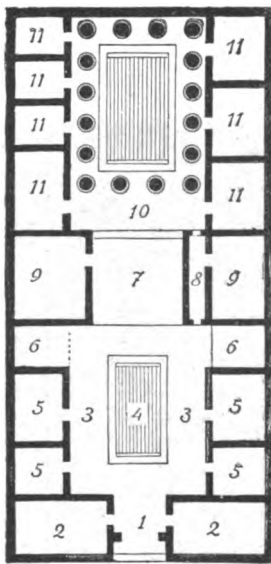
GROUND PLAN OF A ROMAN HOUSE
